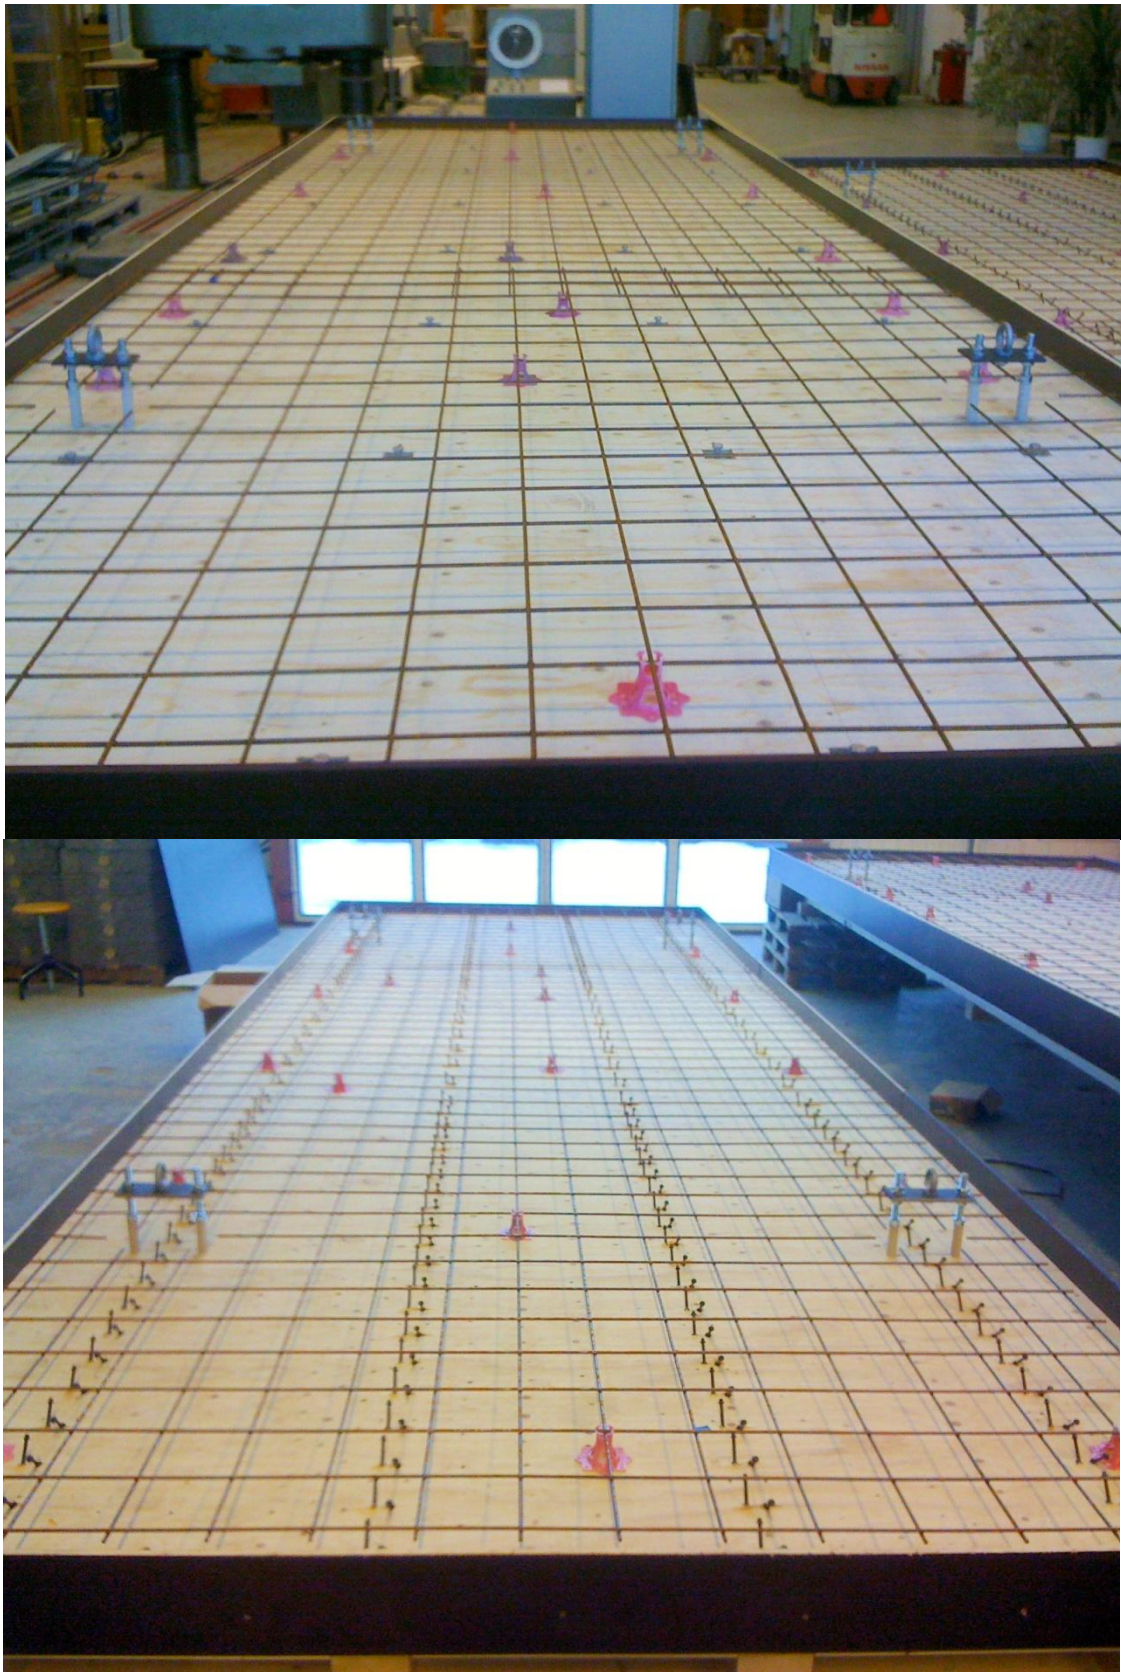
Adding of formwork and reinforcement web for shrinkage reduction
